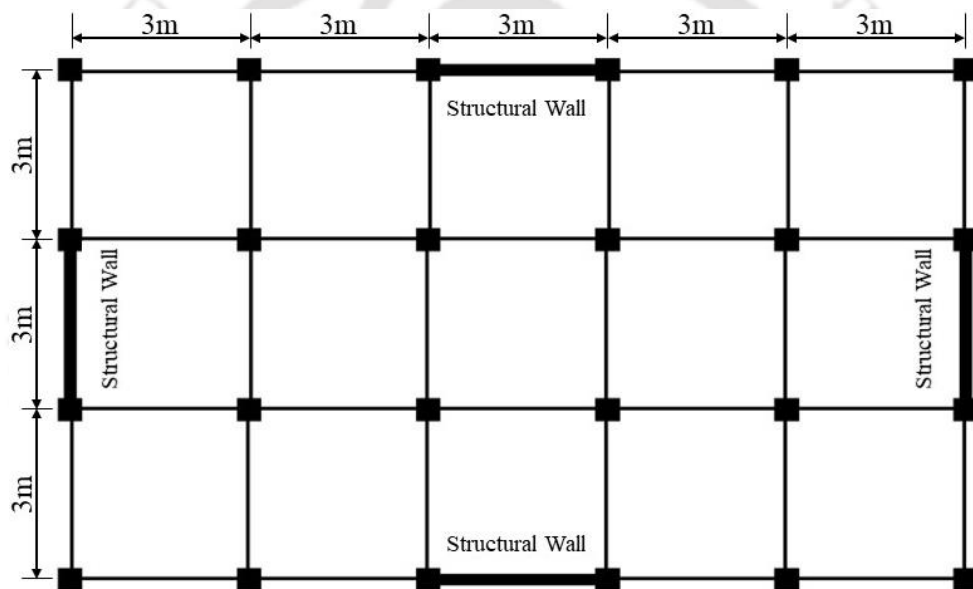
Typical floor plan of the RC wall-frame building considered in the present study.
